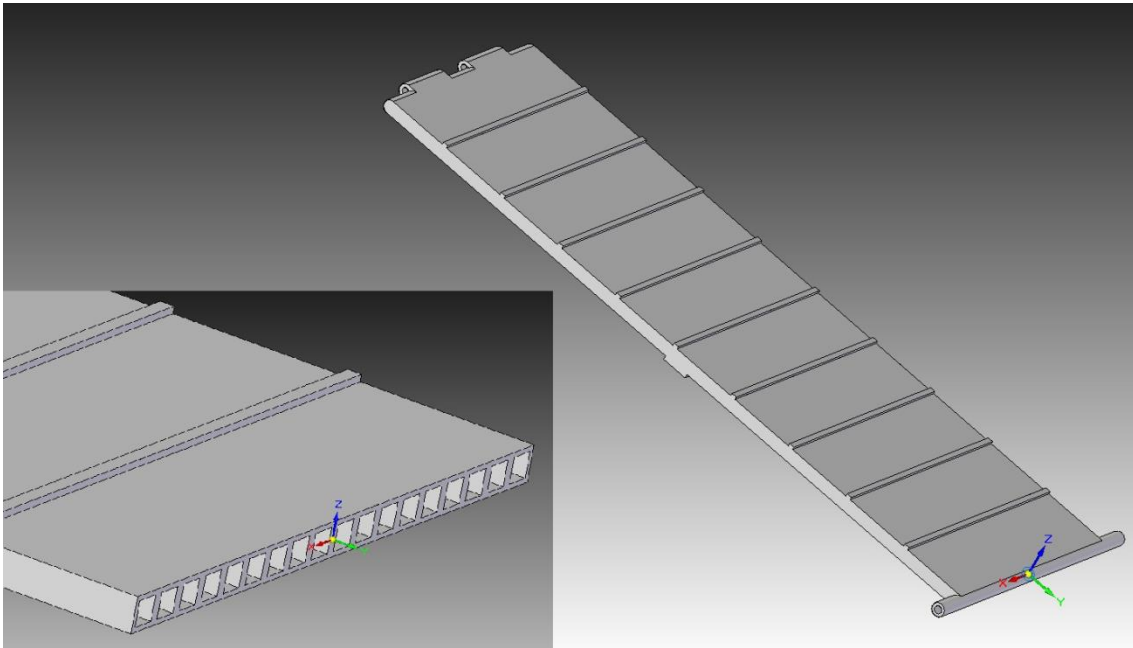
Design 6, multiple box-beams comprising of a structural sheet.
